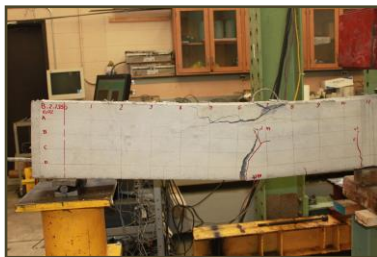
Typical bar rupture mode of failure, Beam S45-4
